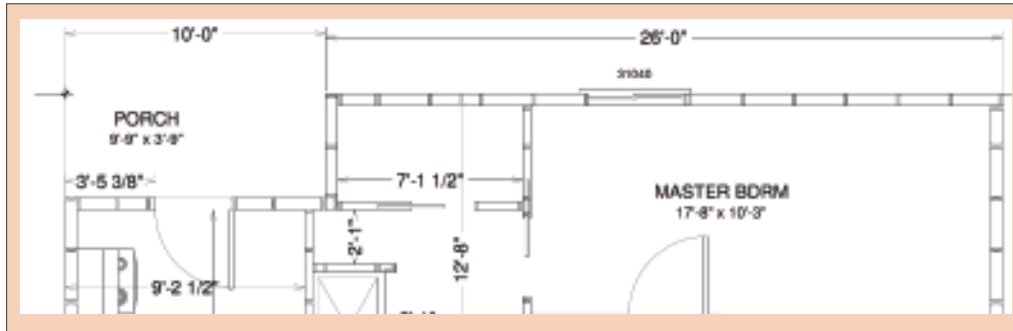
Floor plate based on exterior wall studs set 24" on center
